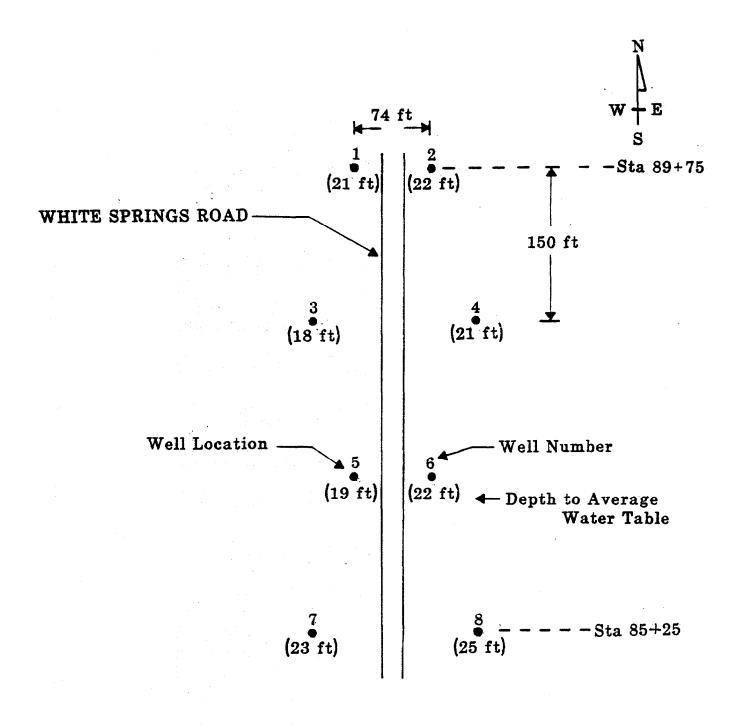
Layout of Monitoring Wells, White Springs Road.
